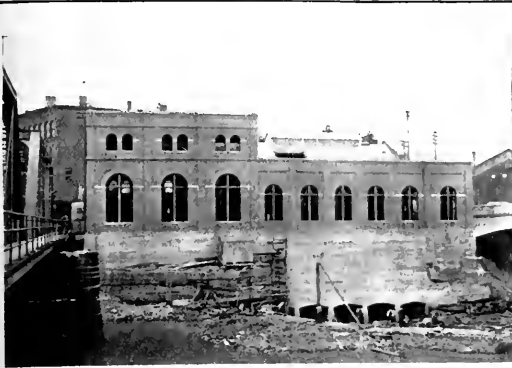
ROCK FOUNDATION OF POWER HOUSE.
